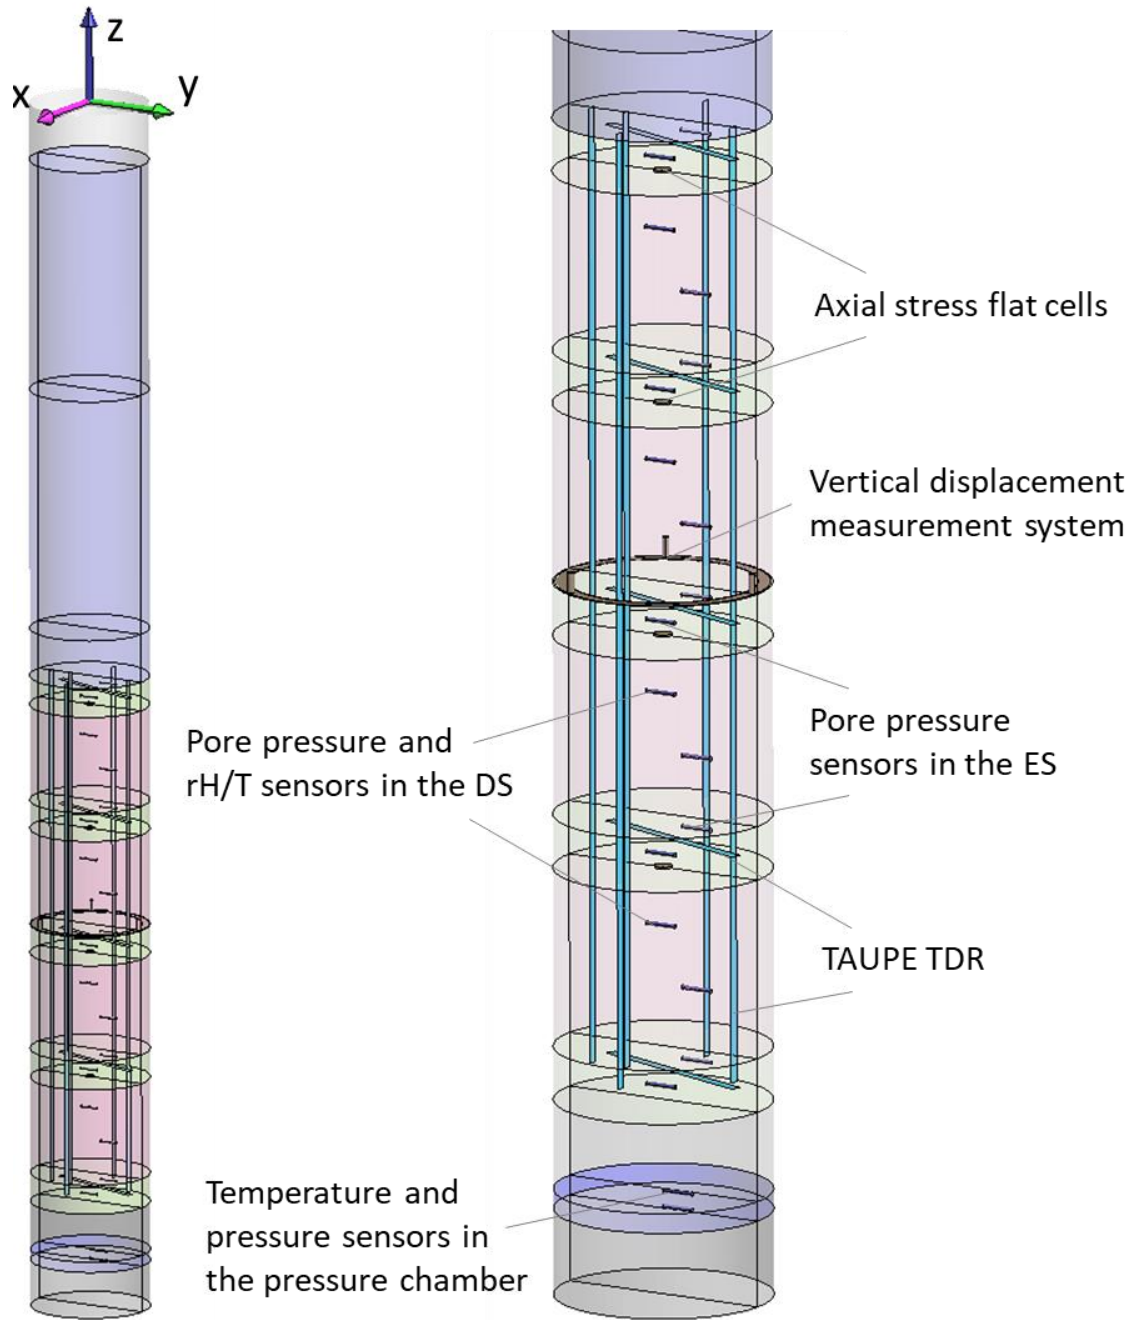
Sensors in the pressure chamber and in the sealing system of Shaft 1
